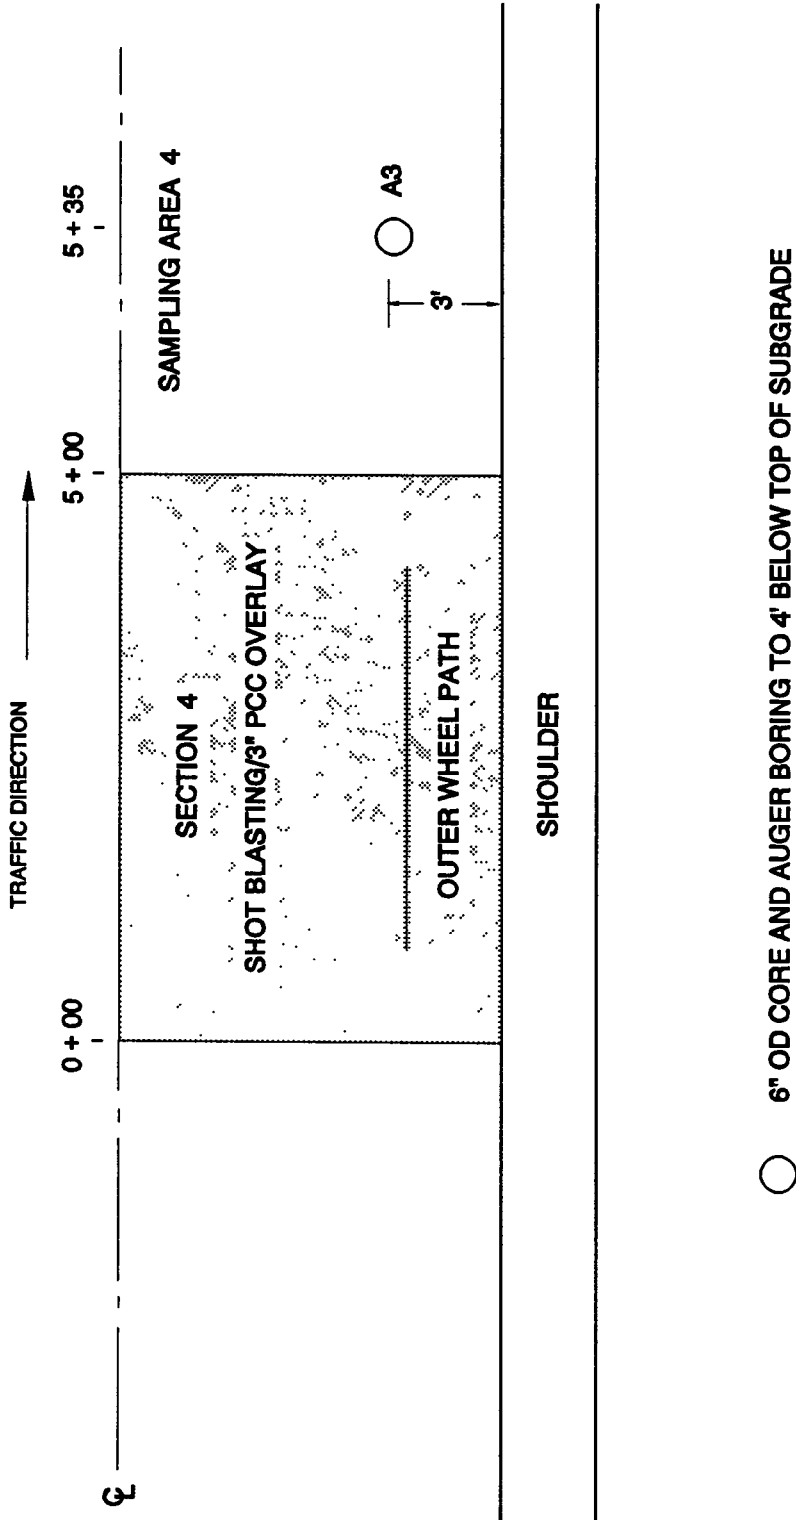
Example of "Pre-Construction" Sampling Plan for Test Section 4
